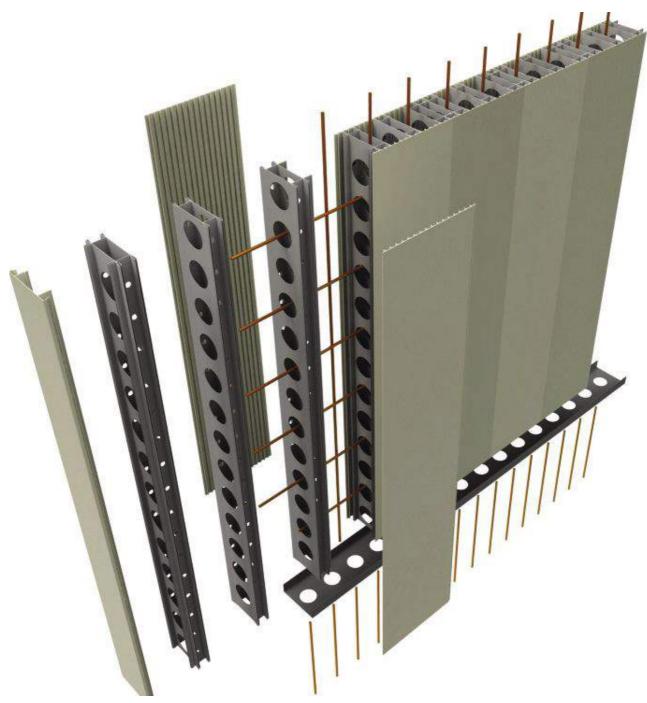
contains a picture from the Permaform website and brochure detailing the construction of the 200 mm thick system. It shows double bracing panels between the faces.
